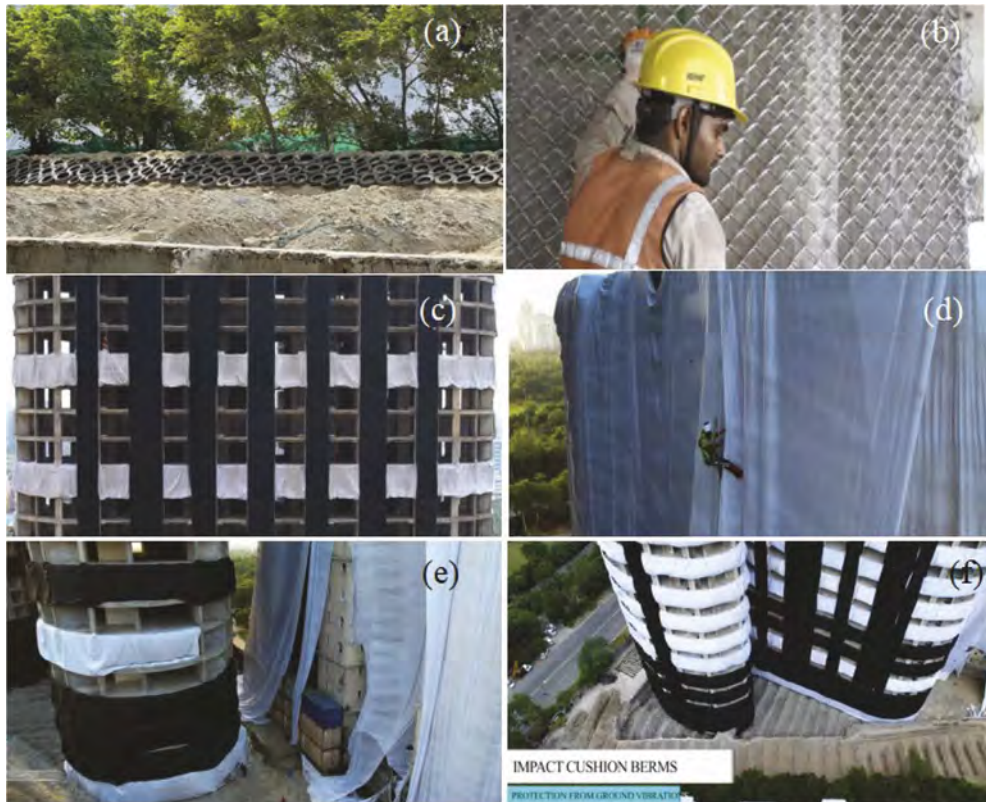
Protection works adopted for demolition of Supertech Twin Tower (a) Berms for protection of gas pipeline (b) Wire Mesh Wrapping around columns (c) Perimeter curtain geotextile walls on blast floors (d) Suspended Geotextile Curtains for adjacent buildings (e) Container wall for protection of Aster 2 (f) Impact Cushion Berms.
